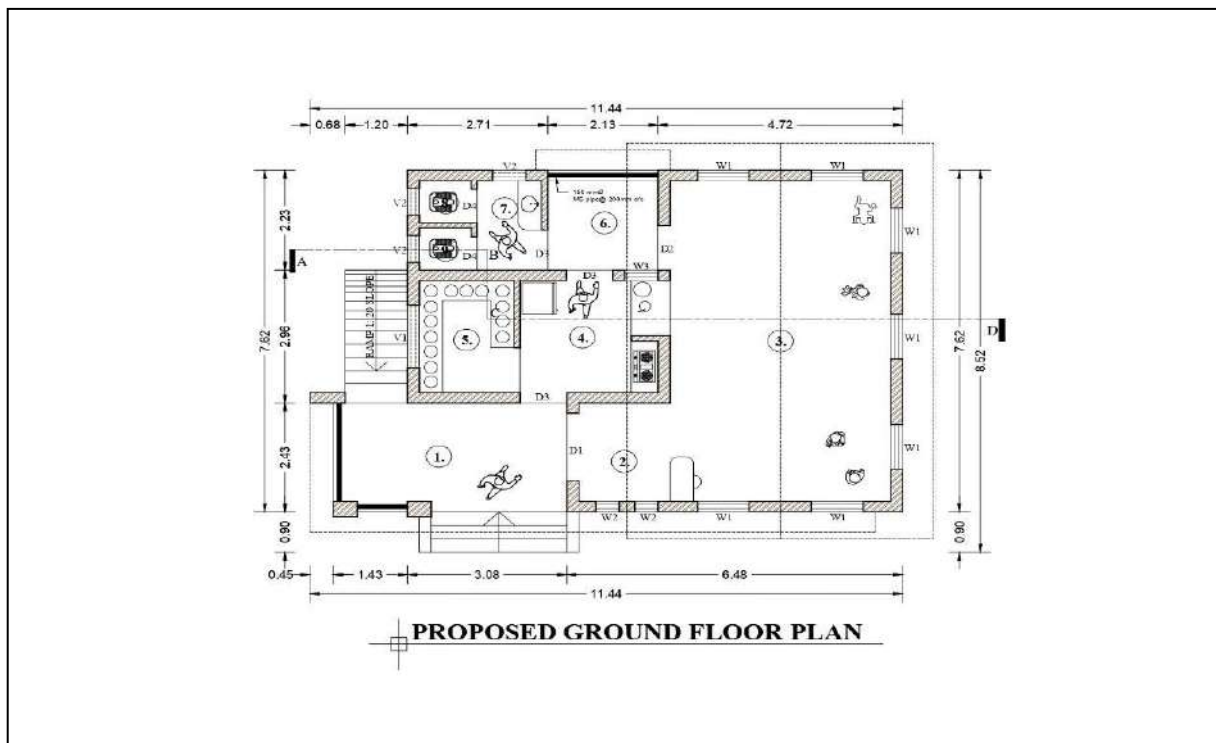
Anganwadi Ground Floor Plan
